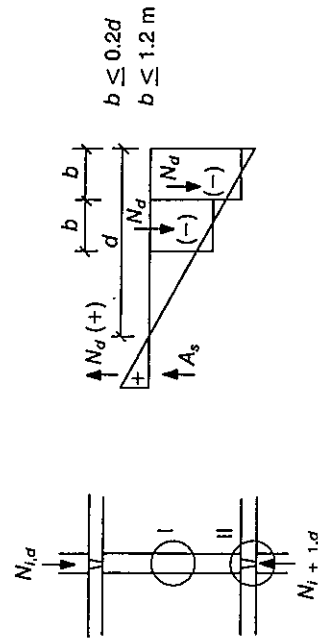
Wall subject to normal forces and in-plane bending
